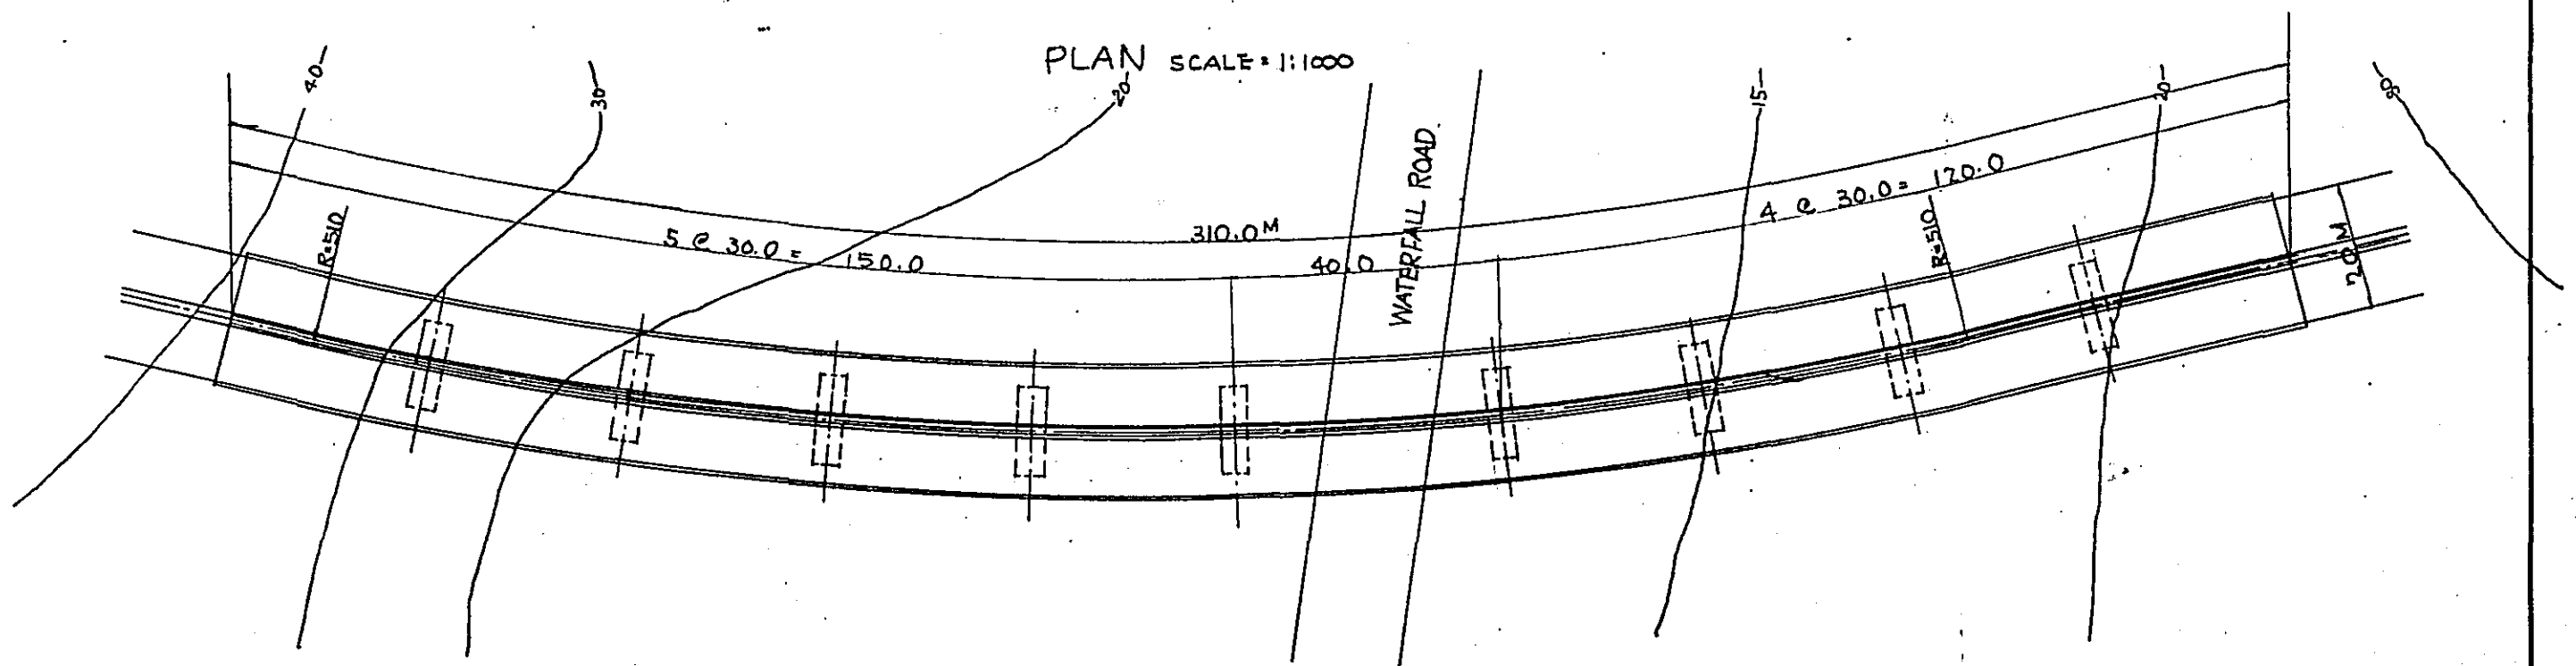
GENERAL VIEW OF WATERFALL ROAD BRIDGE
